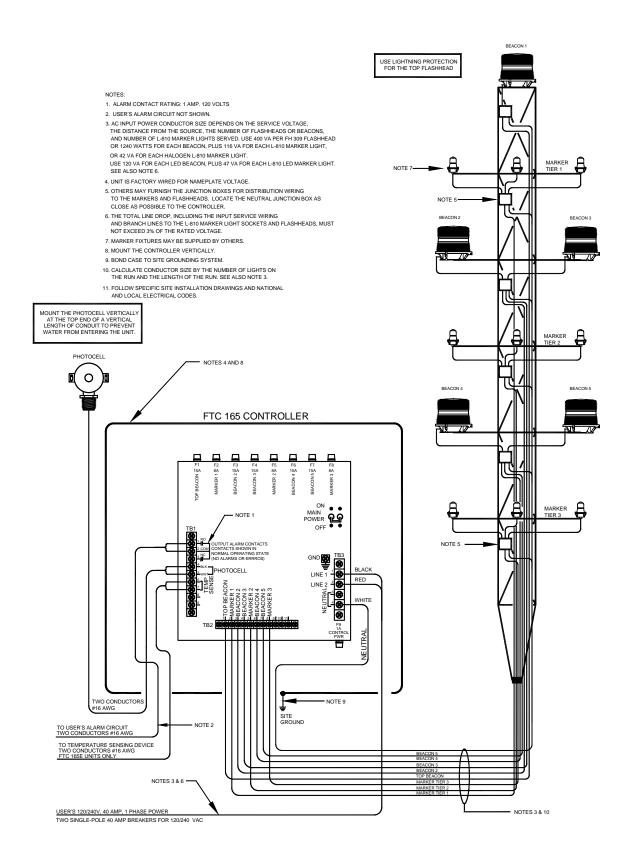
FTC 163 Controller Typical Installation Wiring
